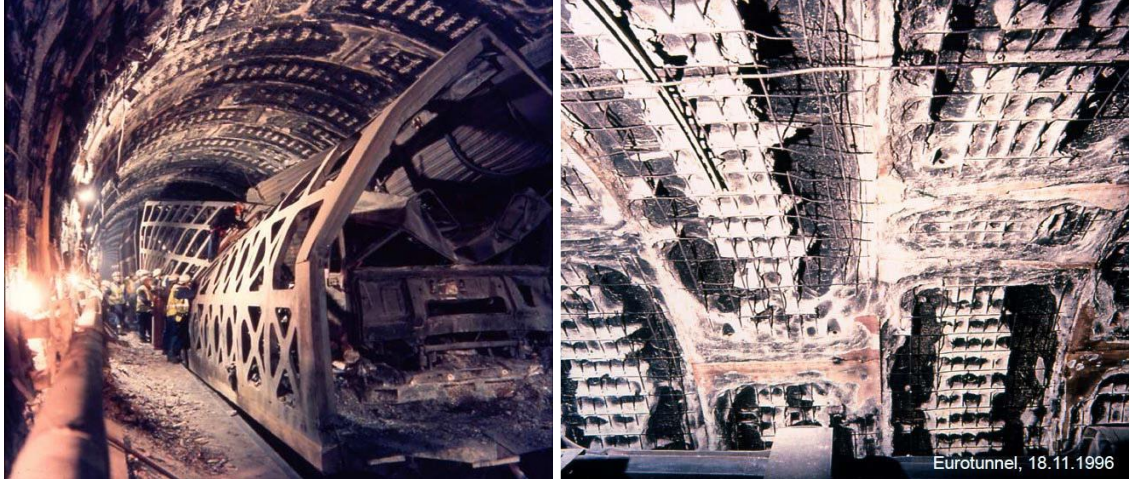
Fire damage to concrete of Channel Tunnel between France and England indicating severe spalling of the concrete lining and exposure of the reinforcement.
